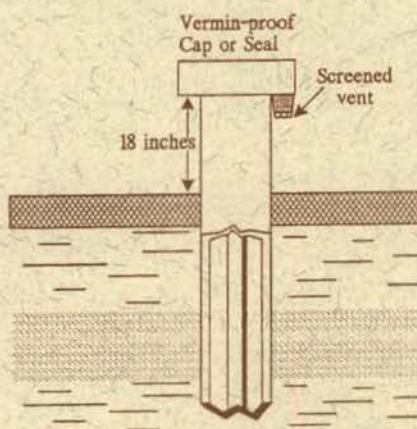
An example of the BMP principles stressed for well construction—casing and well depth.
